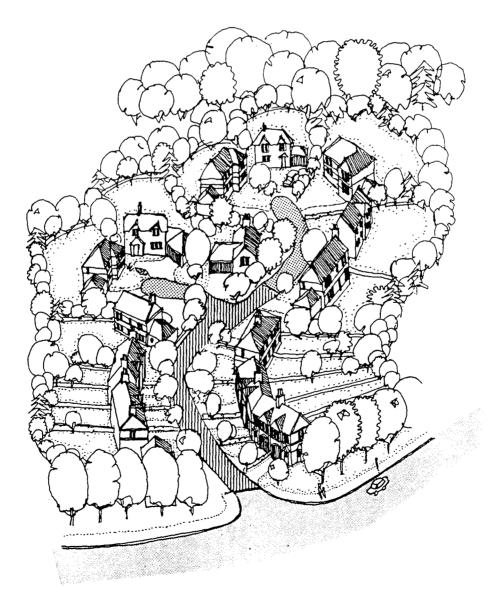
Sketch Layout To Show A Shared Access Way In Site B
